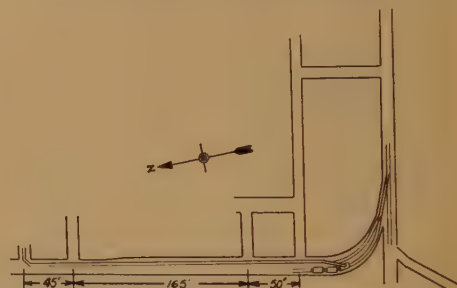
SHAKING CONVEYOR DRIVE FROM HAULAGE ENTRY.
